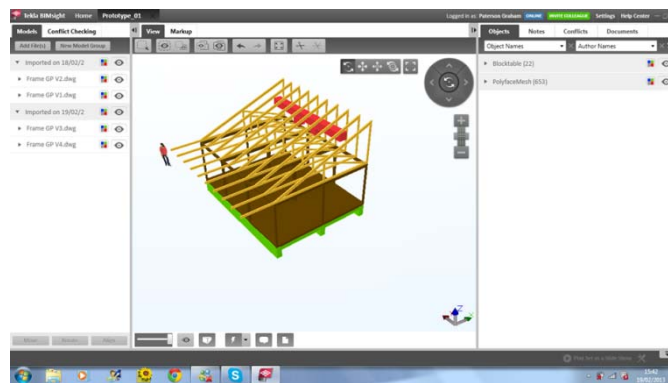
BIMtoolkit: federated model combining four separately designed instances in the Tekla BIMsight viewer. 1) Substructure + floor slab, 2) superstructure general arrangement, 3) specialist timber roof trusses, 4) Heat Recovery Ventilation (HRV) ducting.
